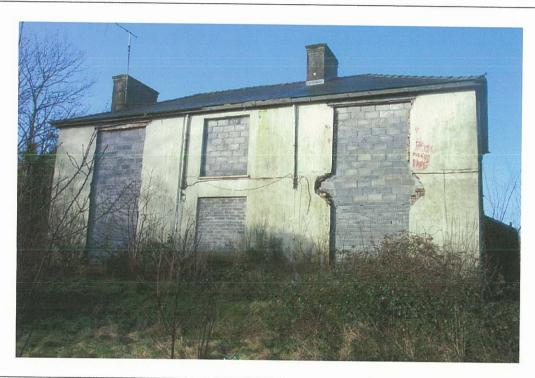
Front elevation of Starling Park House showing the removed and blocked up bay windows.
